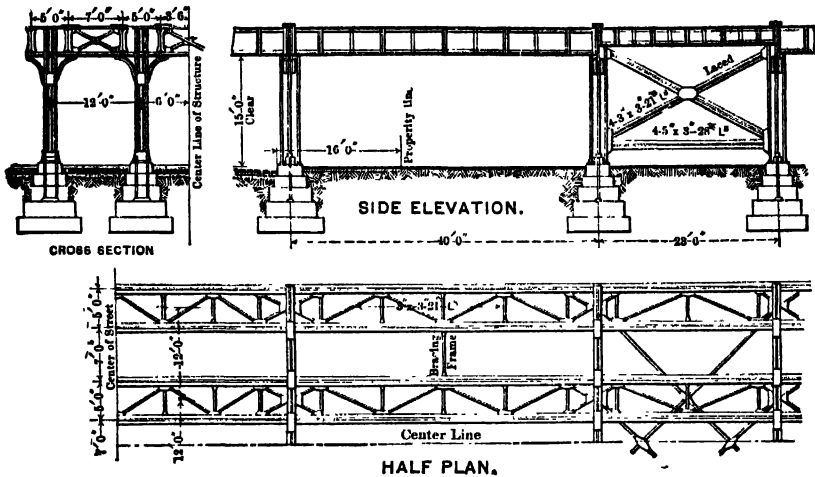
Plan, Elevation, and Cross-section for a Four-column Elevated Railroad.
